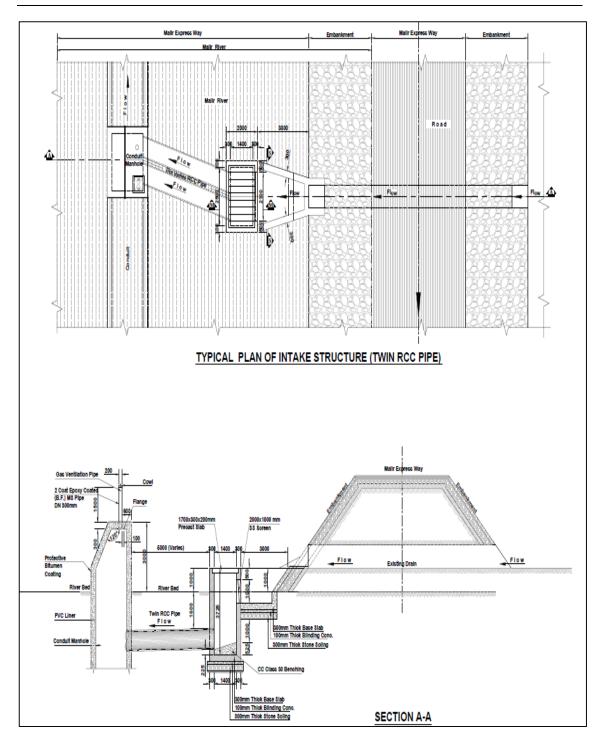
Typical Plan of proposed Sewer Connections Intake Structure
